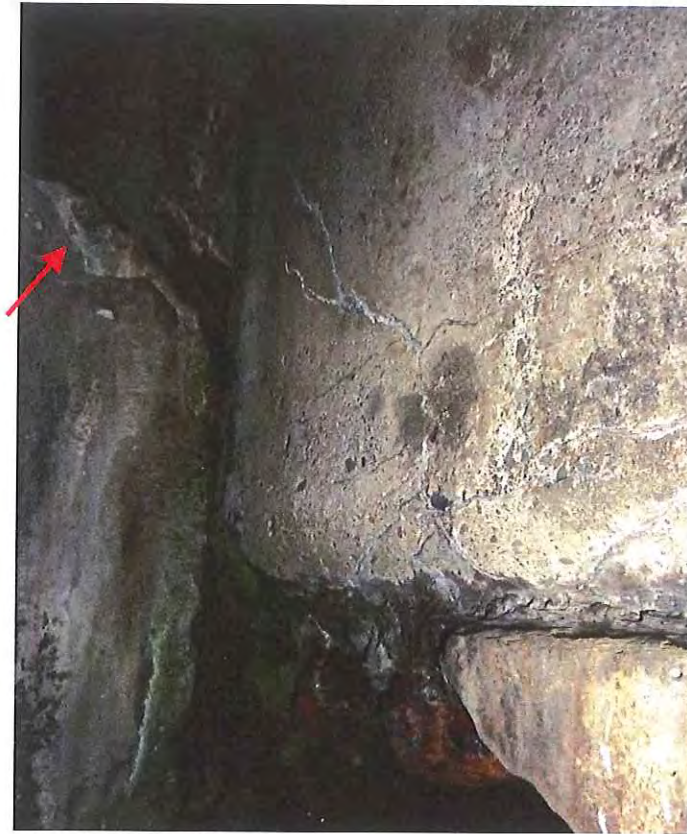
DEFECT: - Wingwall spalling area 3m x 3m
